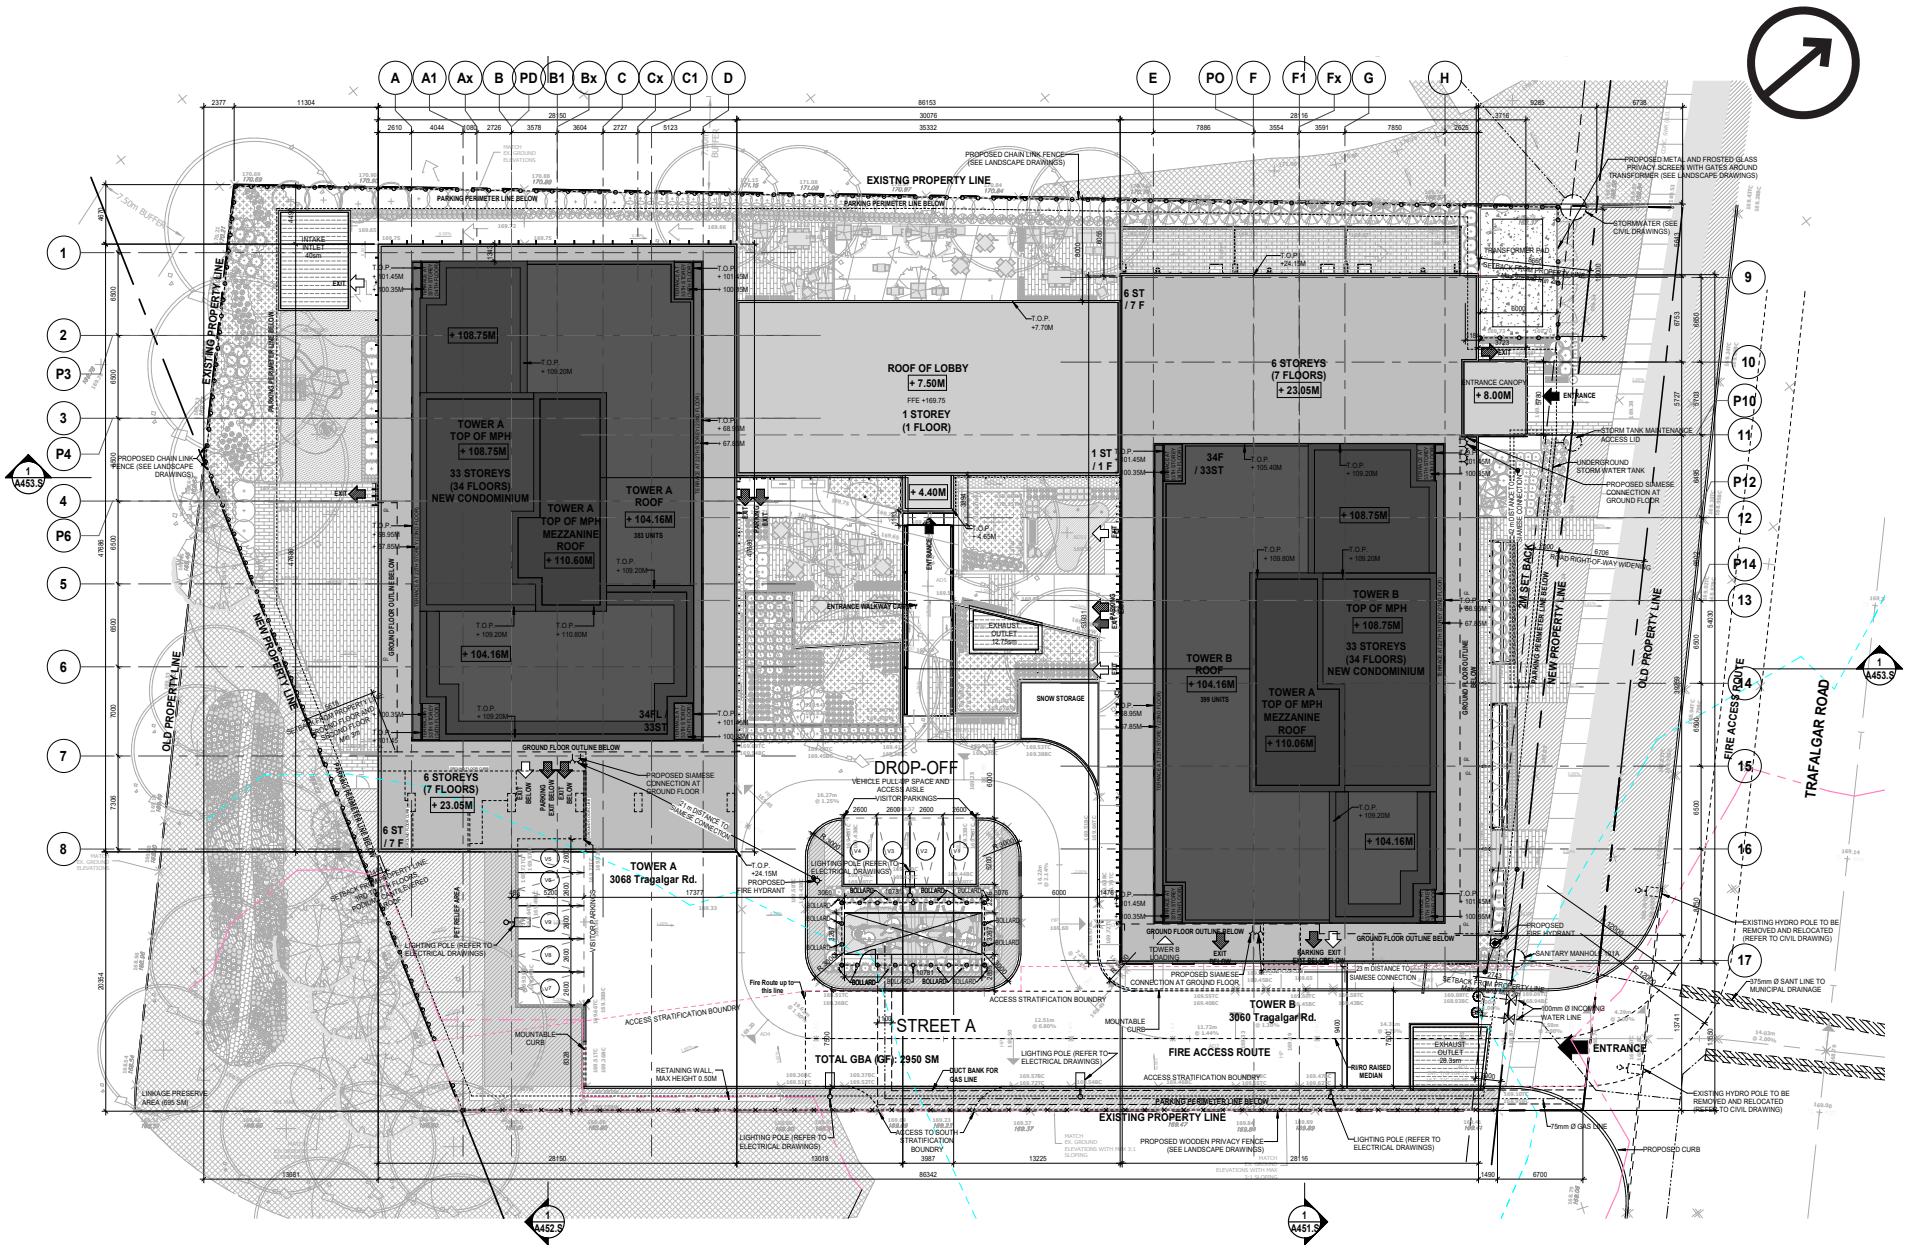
Site Plan by Quadrangle Architects Limited (not to scale)
